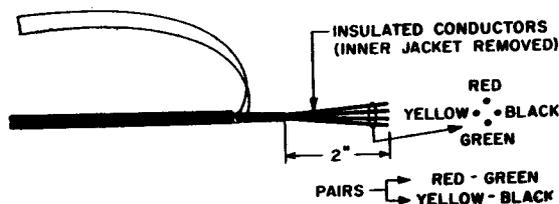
B SERVICE WIRE WITH INNER AND OUTER JACKETS REMOVED
